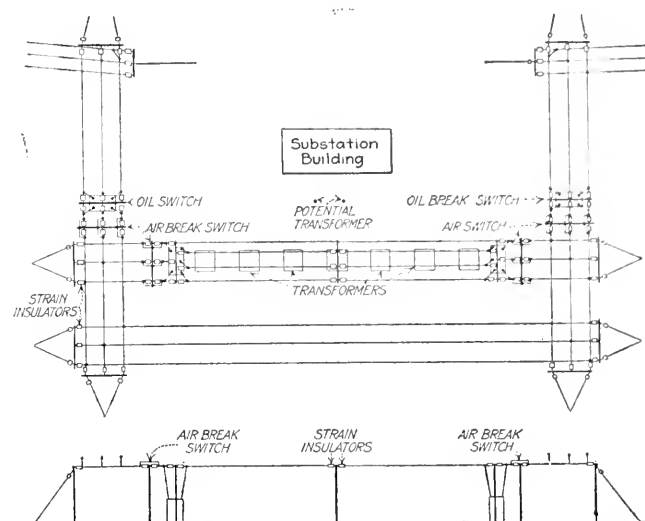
ARRANGEMENT OF OUTDOOR SUBSTATION EQUIPMENT AT MADERA, CAL.
